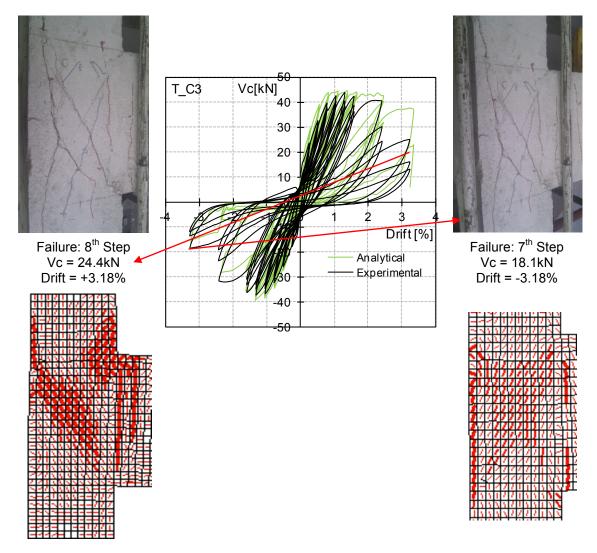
Experimental and analytical crack patterns at joint panel shear failure (Crack widths: thin<2mm; thick>4mm).
